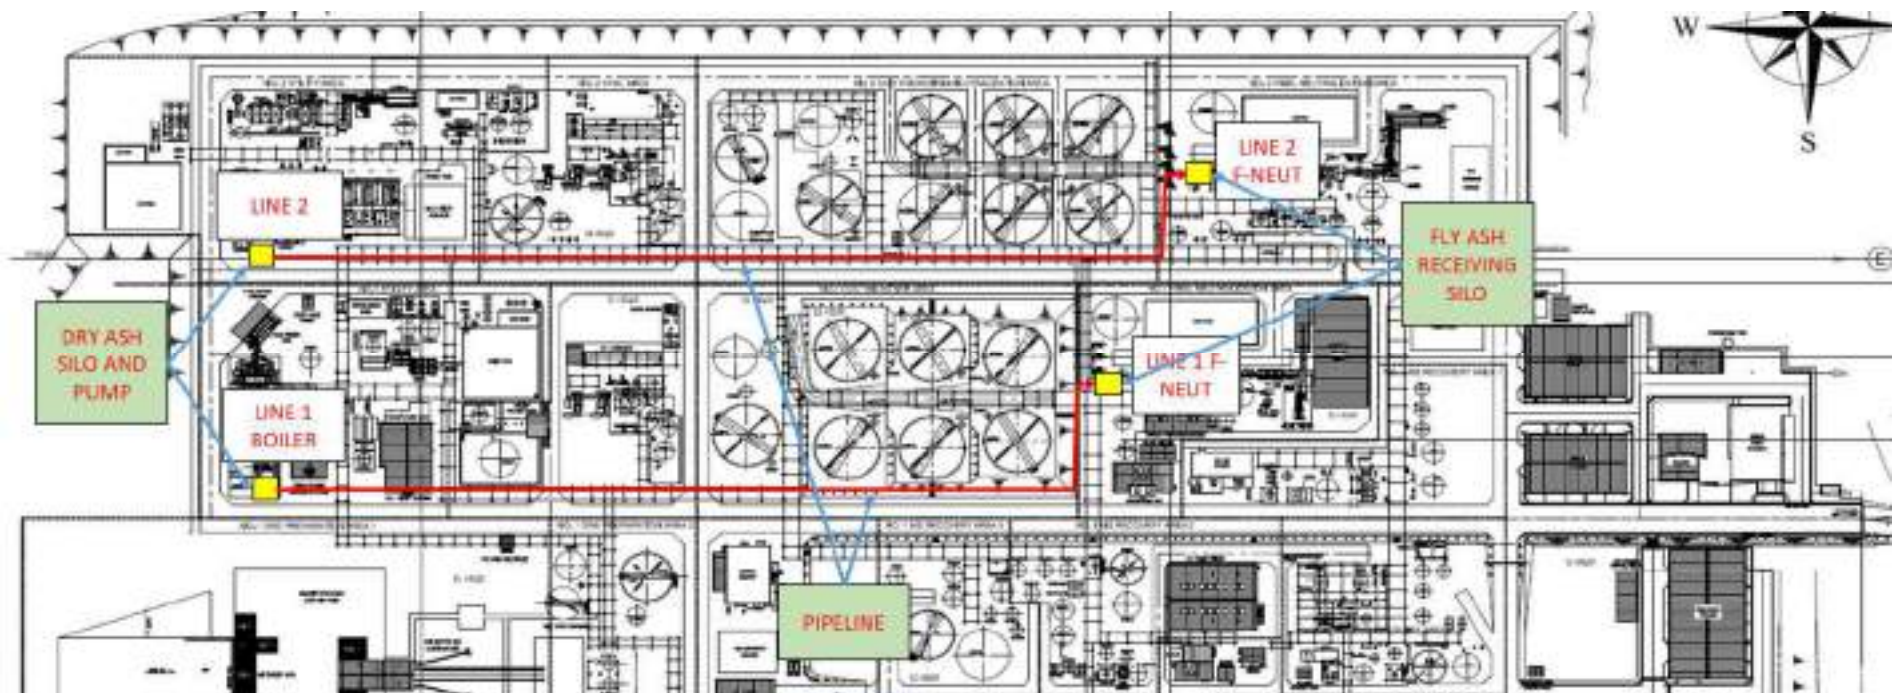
Plant Layout of the Ash Disposal System to Final Neutralization Plant
